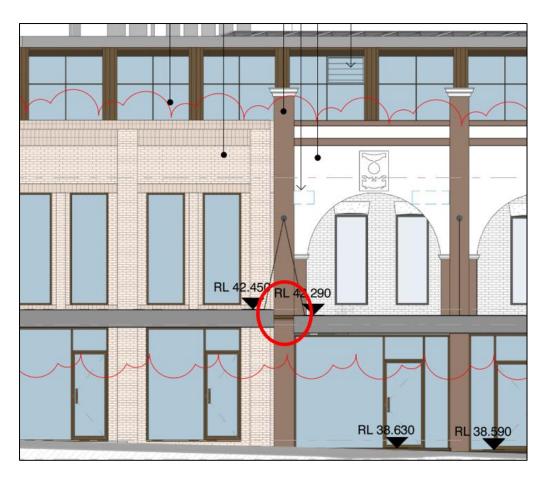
Proposed Crown St elevation showing the interface between the retained awning (right) and new awning (left)
